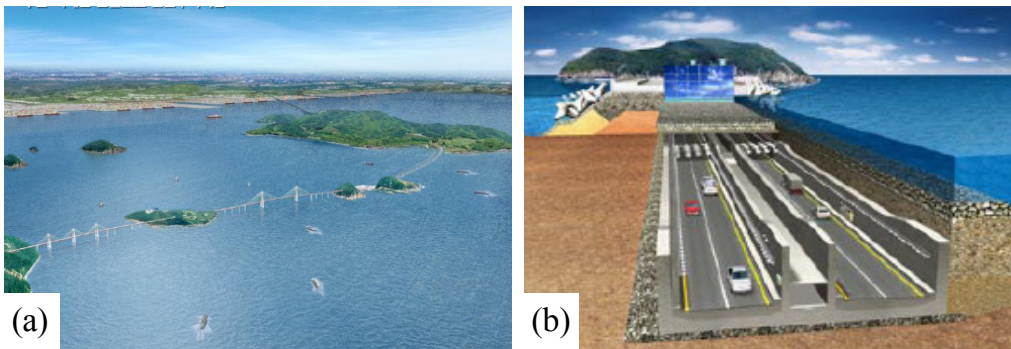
The Busan – Geoje Fixed Link: (a) overall view; section of the Immersed Tunnel (COWI, 2009).
